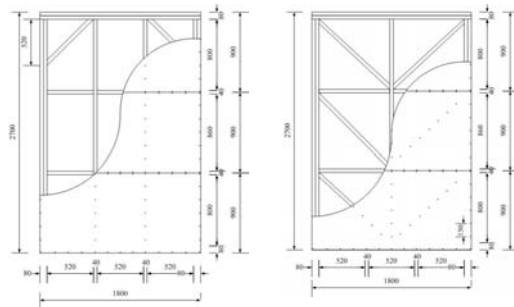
Conventional shear wall frame (SWC) and Braced Shear wall frame (SWB) specimens.
